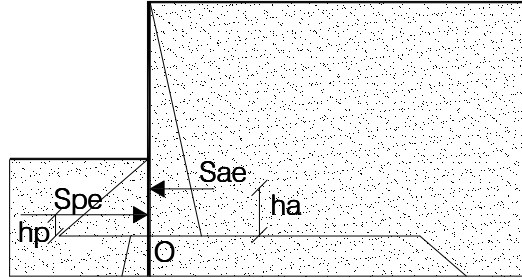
Limit equilibrium condition for a cantilever retaining wall: seismic active and passive pressures on a cantilever retaining wall.
